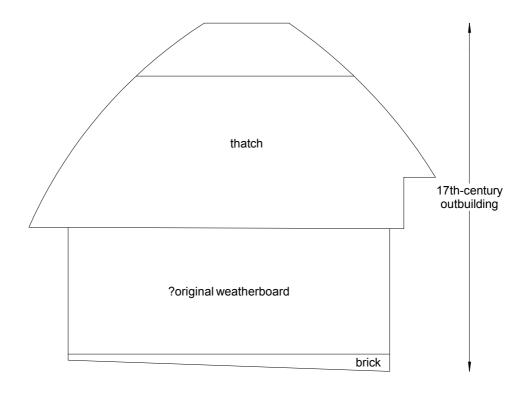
North elevation of structure 5 (17th-century outbuilding).
